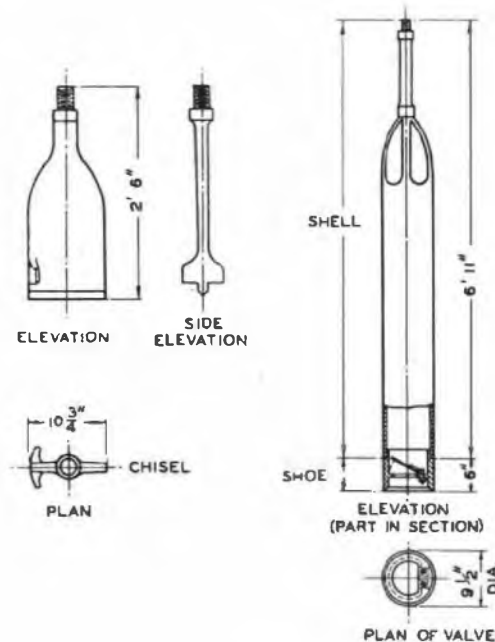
BORING TOOLS FOR 12 IN. DIAMETER BORE HOLE.
